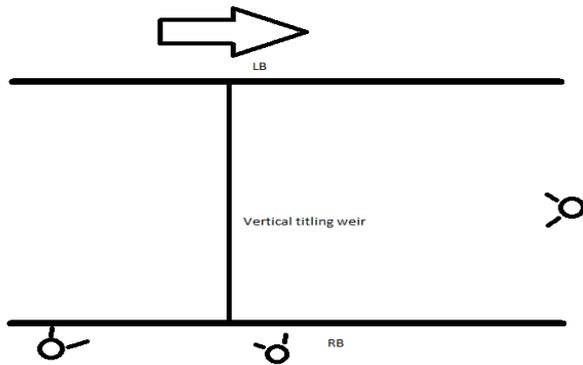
Site plan for Mereway Barrier 4
